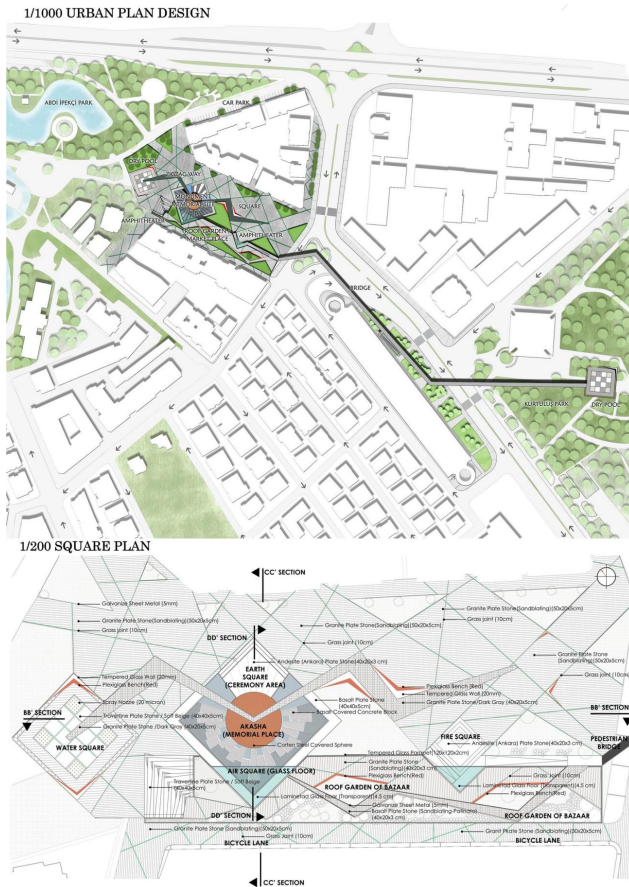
1/1000 Urban design plan and 1/200 application plan.
